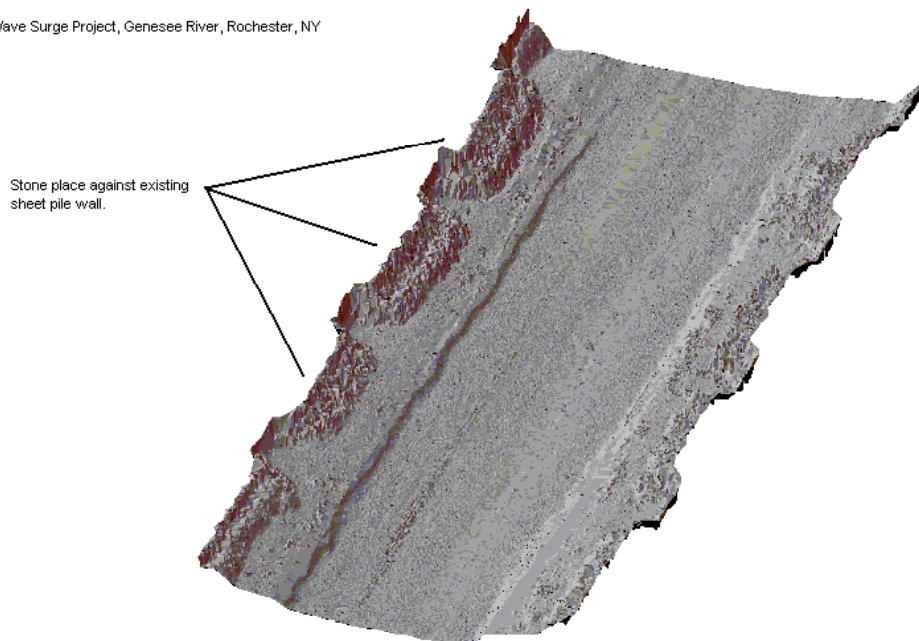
Sheet pile wall multibeam surveys. Genesee River, Rochester, NY (Buffalo District)
